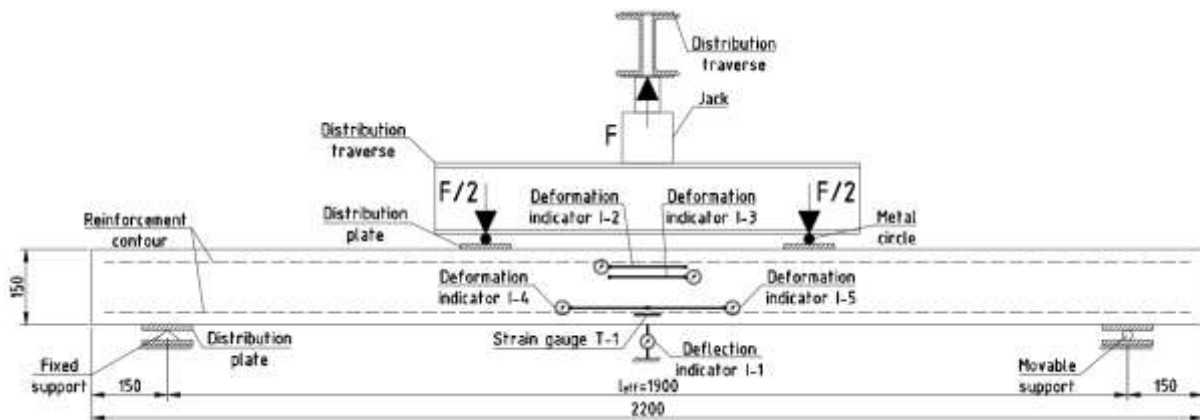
Test scheme for beams B-1.1 and B-2.1 without post-tensioning technology
